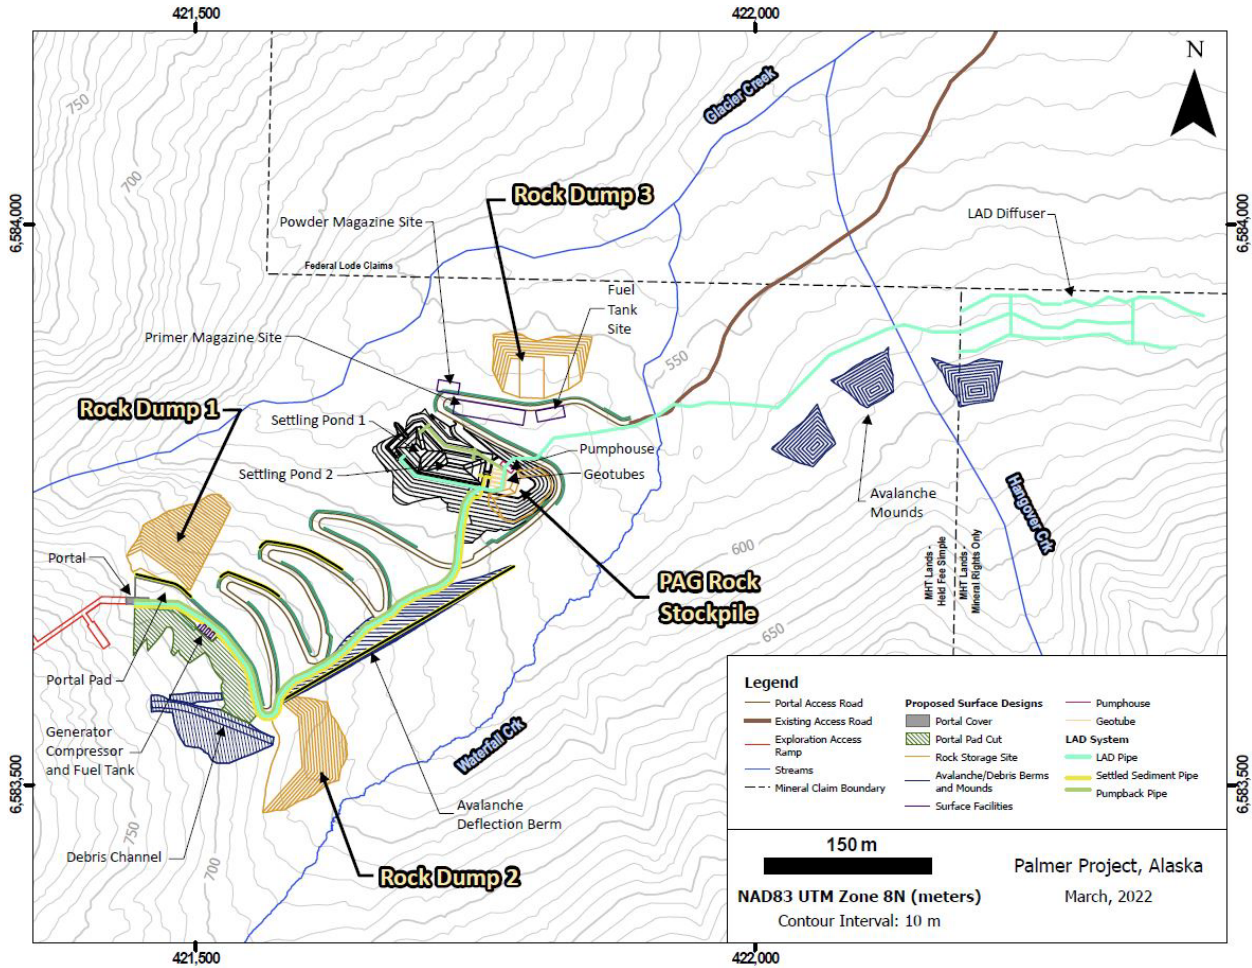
Surface Facilities including Waste Rock Disposal Sites (Rock Dumps 1,2,3, Avalanche Berm and Avalanche Mounds)
